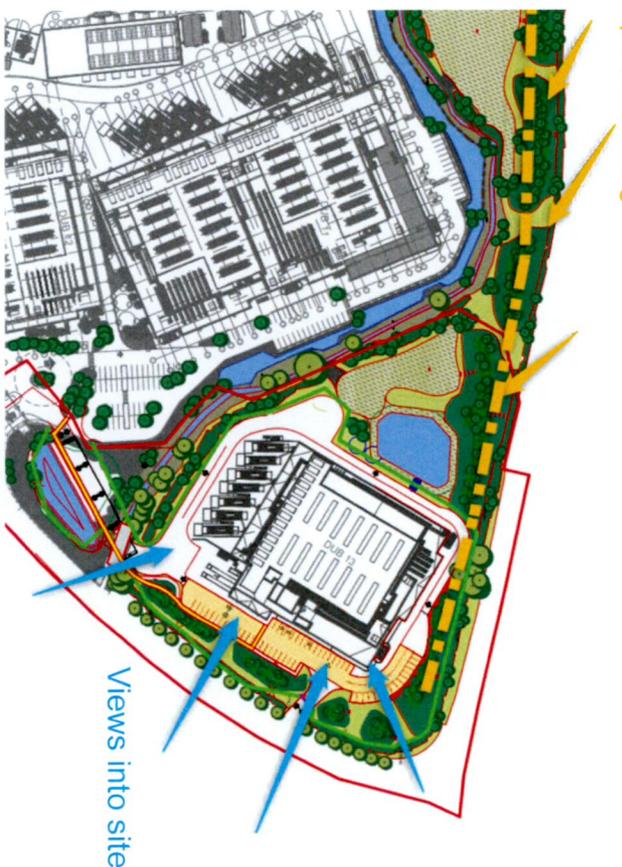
Site Plan showing the Landscape Screening and Views into the Site
